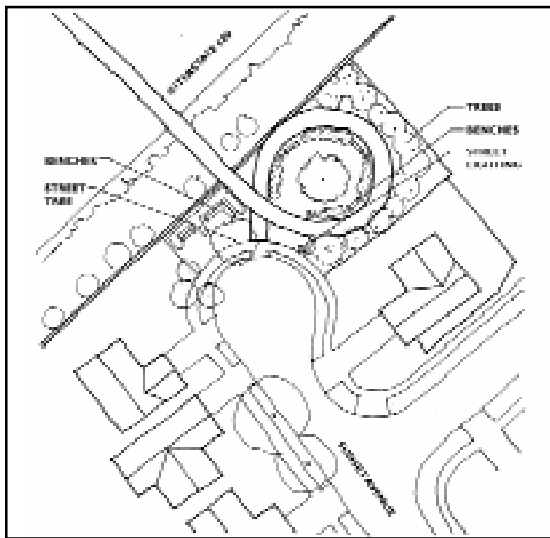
Sunset Pedestrian Bridge Area Landscaping Design Concept
